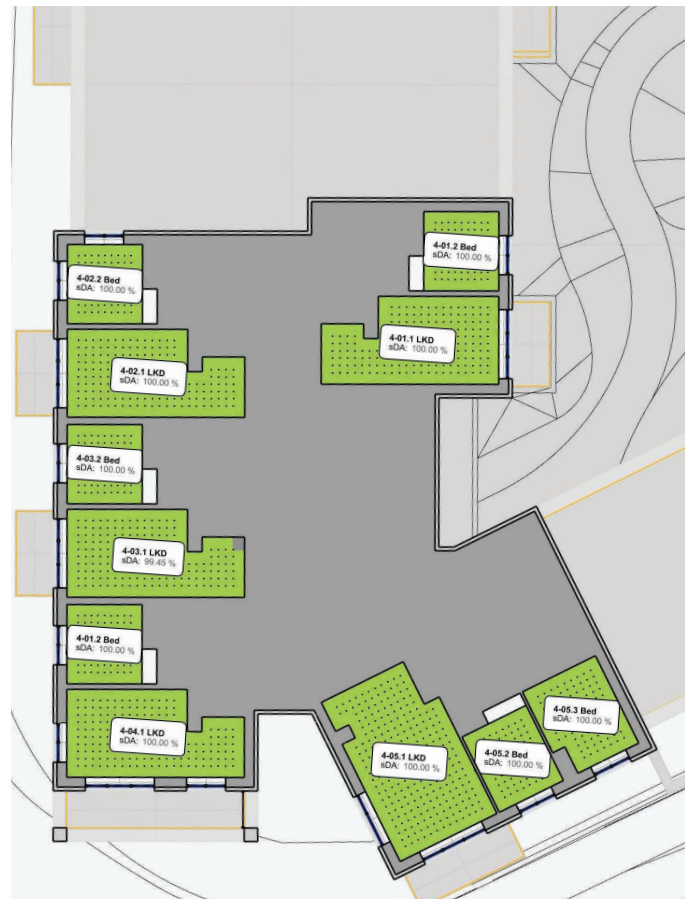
Floor plans indicating Daylight Provision to BS EN17037:2021+A1 Table NA.1
